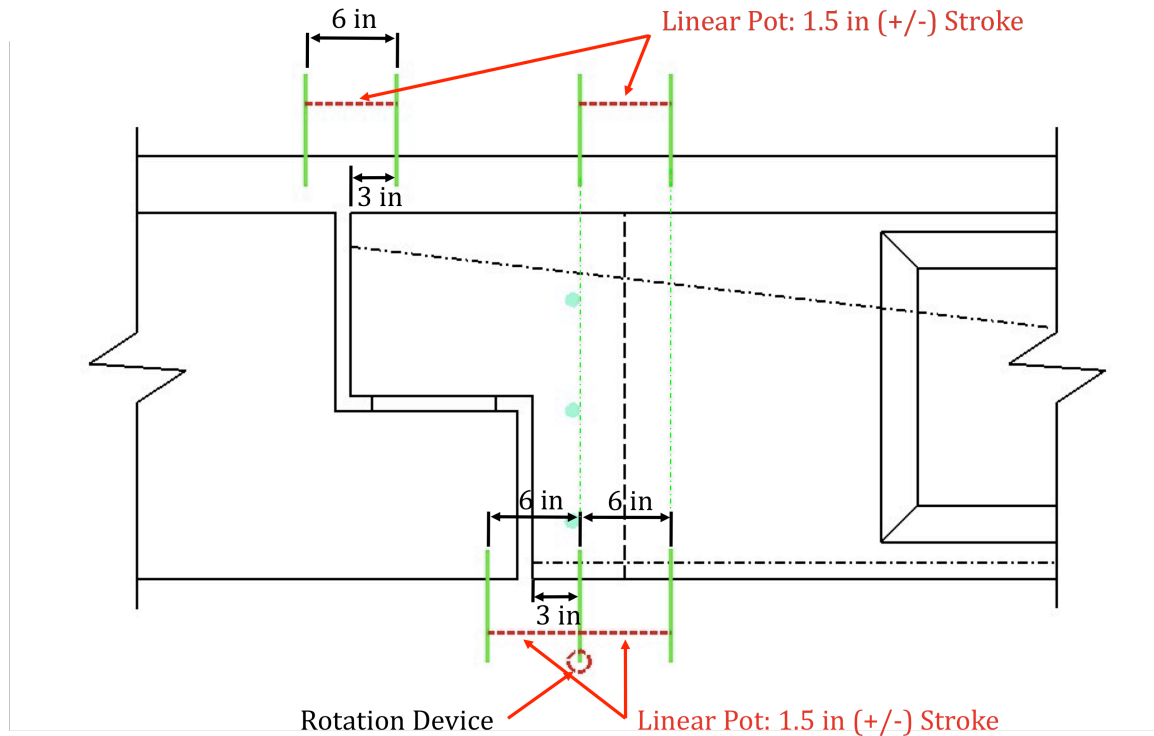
Girder-to-Cap Beam Connection Instrumentation Scheme
